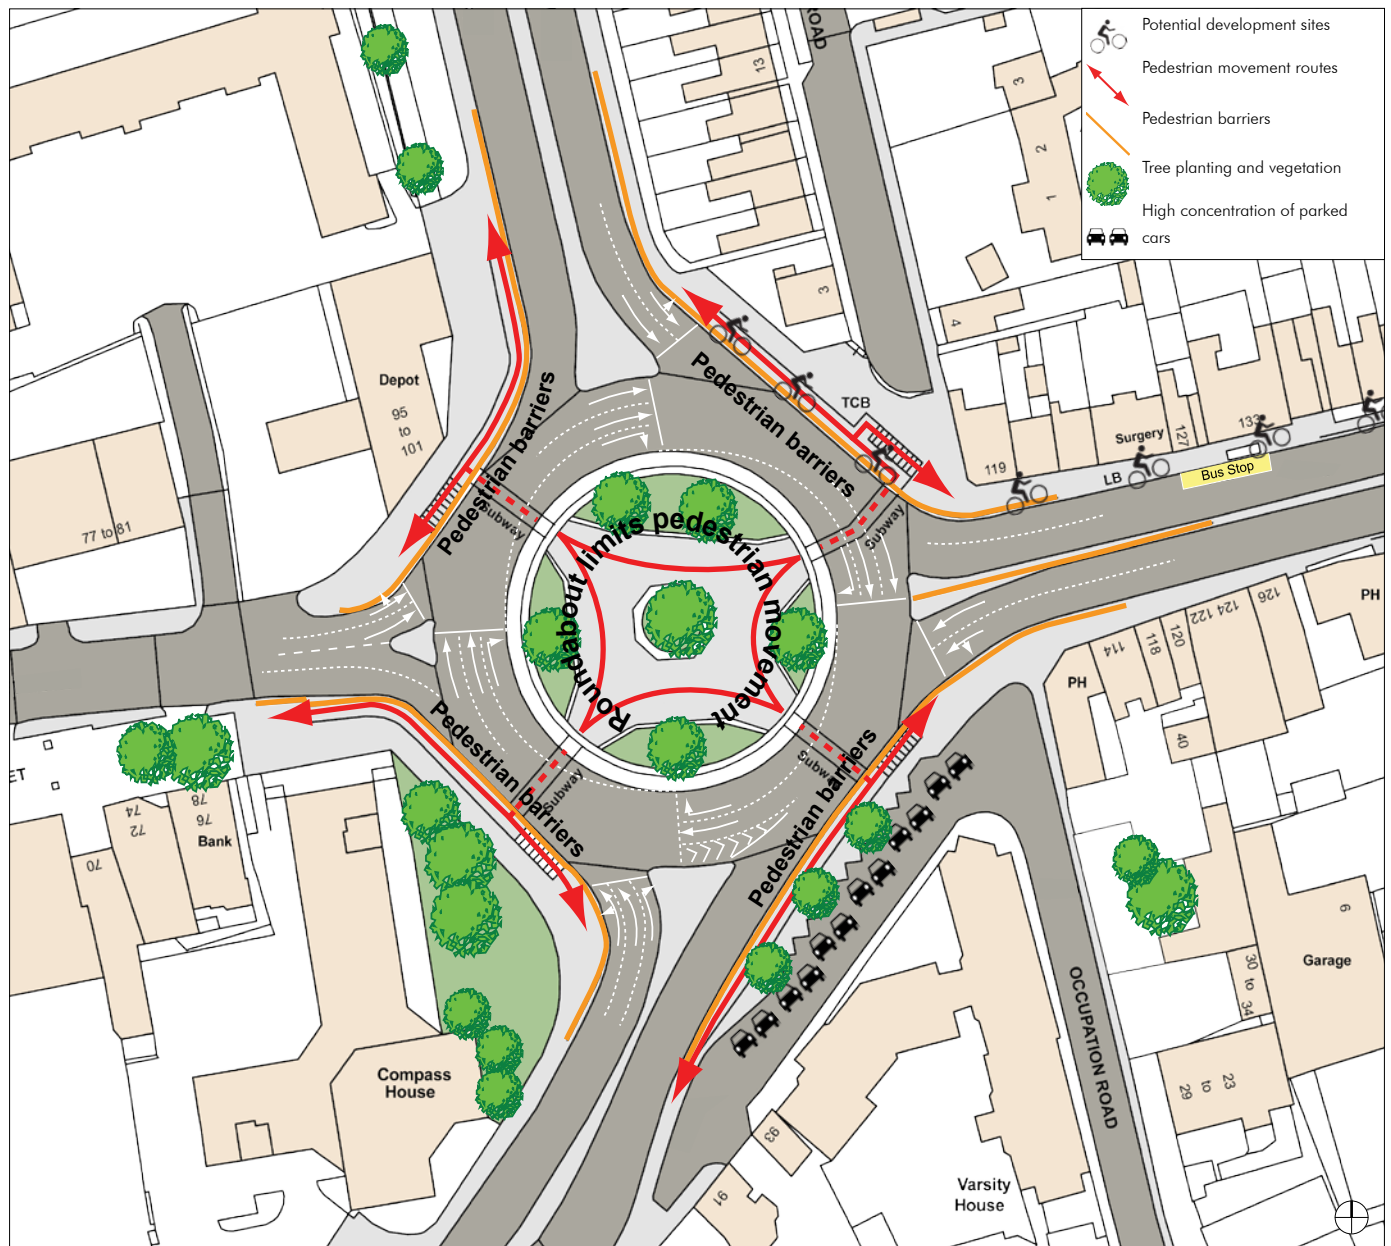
Existing arrangement of Elizabeth Way Roundabout
